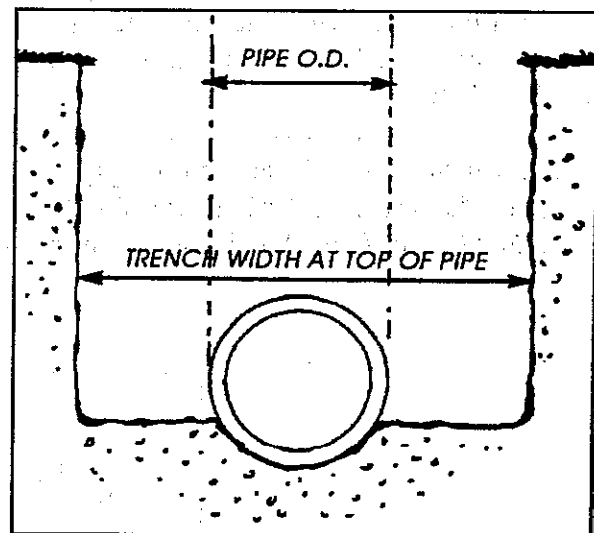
Special Requirements, Trench Width Must be 1.25 x O.D. of Pipe Plus 12 Inches.
